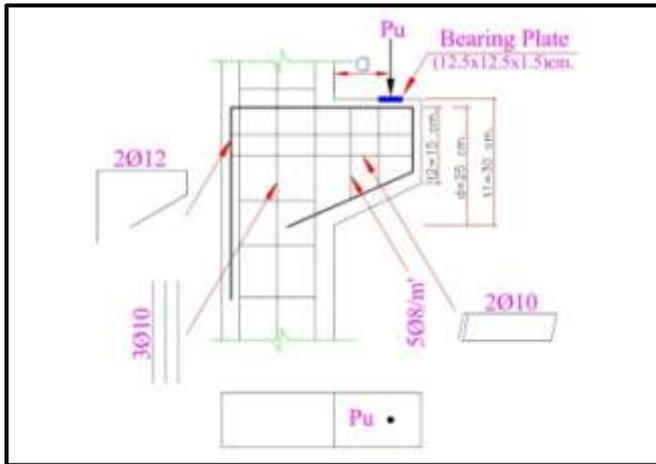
Concrete dimensions and reinforcement details of a typical specimen
